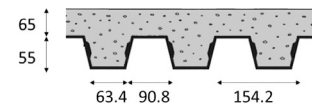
Section of cold formed profiled steel sheeting element. Dimensions in mm.
